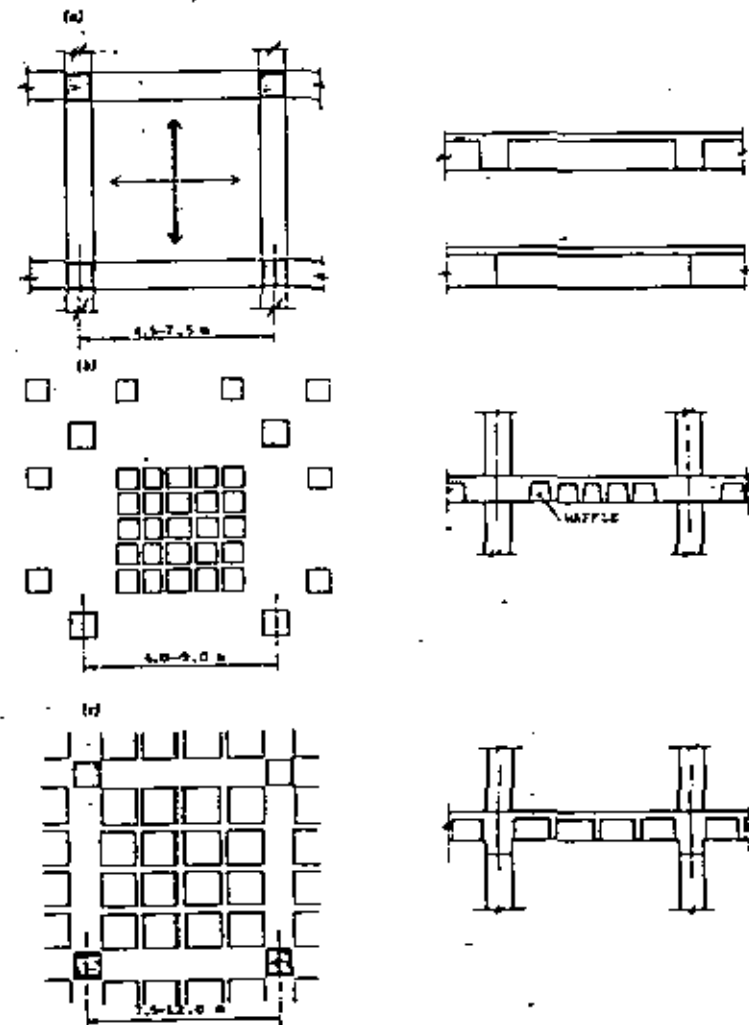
Two-way systems: (a) Flat slab spanned between girders or bearing walls; (b) Waffle slab supported by columns; (c) Two-way joists (ribbed slab)
